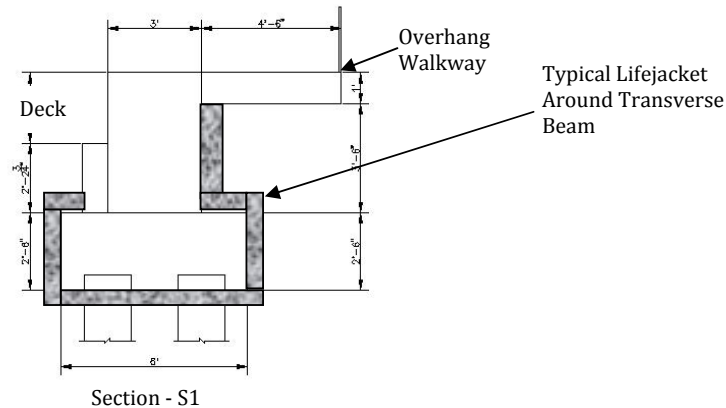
Typical Lifejacket Installed to Transverse Beams
